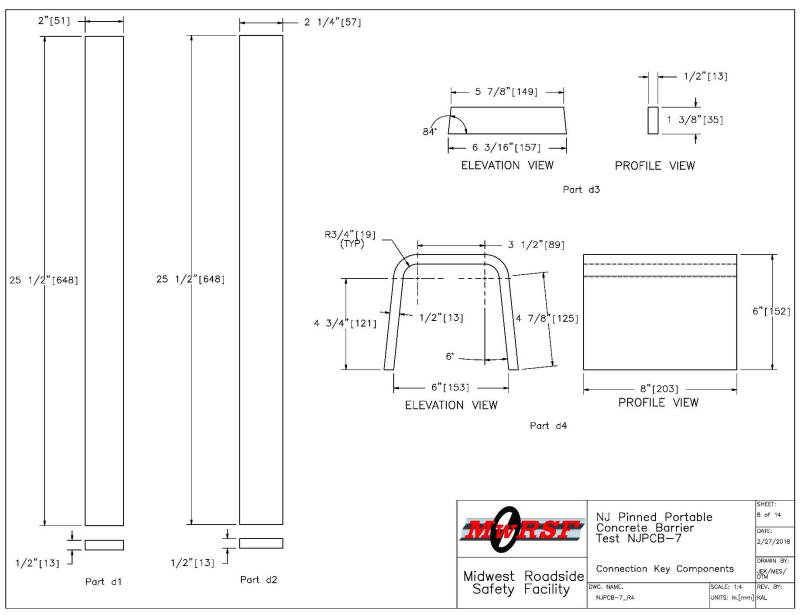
PCB Connection Key Component Details, Test No. NJPCB-7
